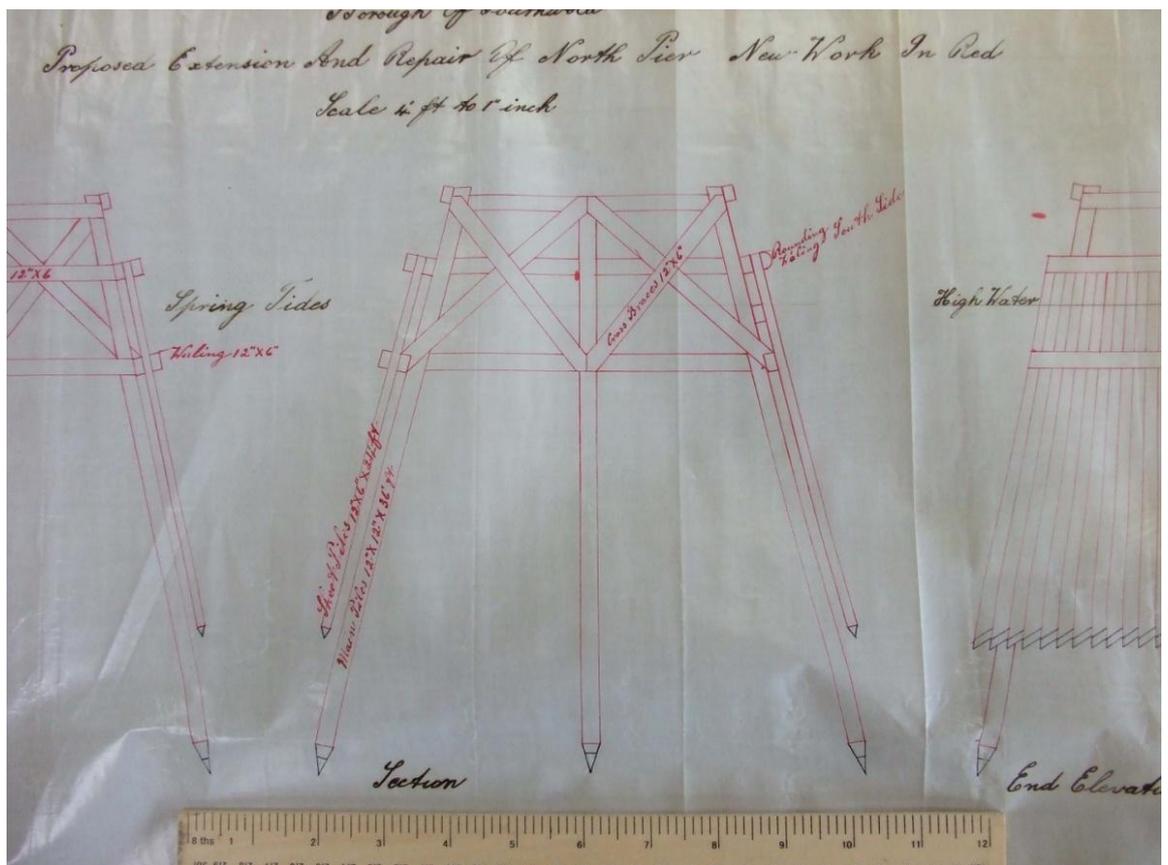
, Section, from drawing of 1902 for North Pier rebuilding/extension (1312/6/8)
